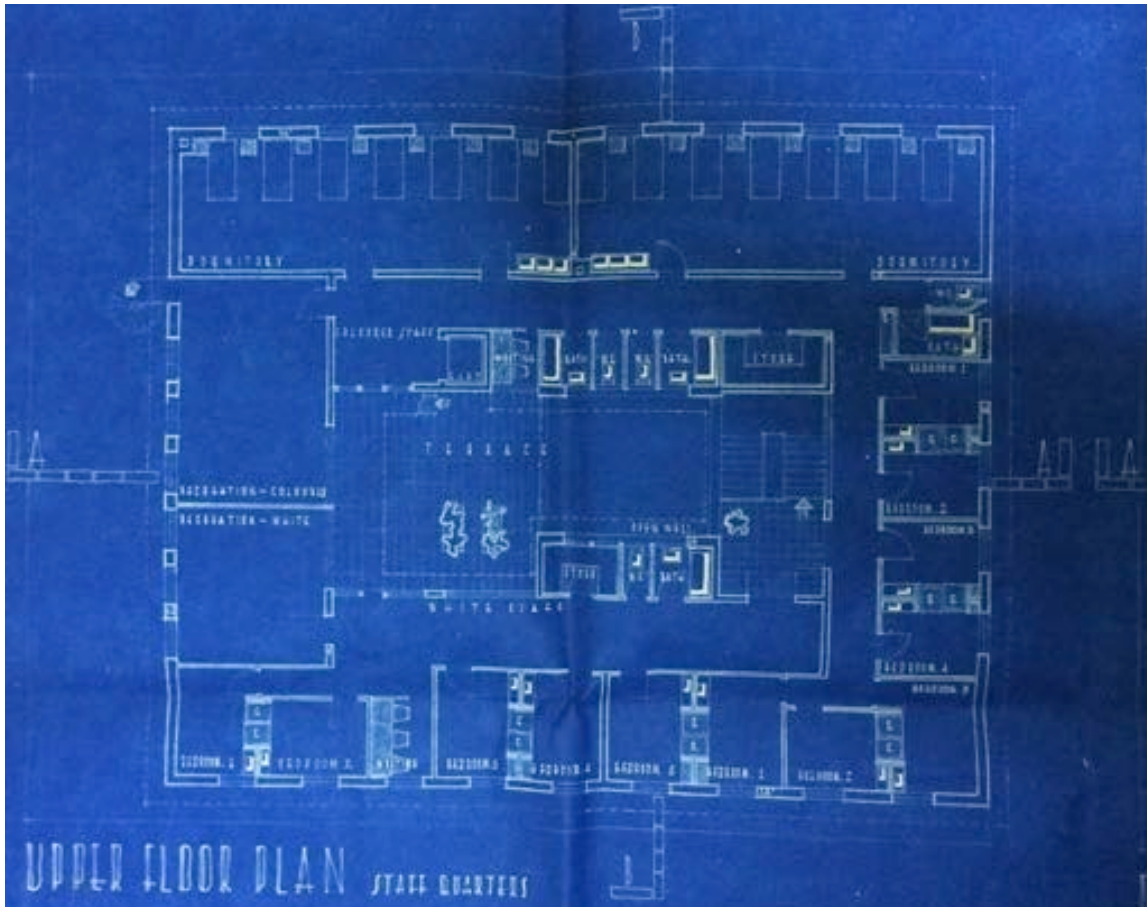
St. Monica's Home upper floor plan (Walgate & Elsworth Architects, 28th July 1944).
